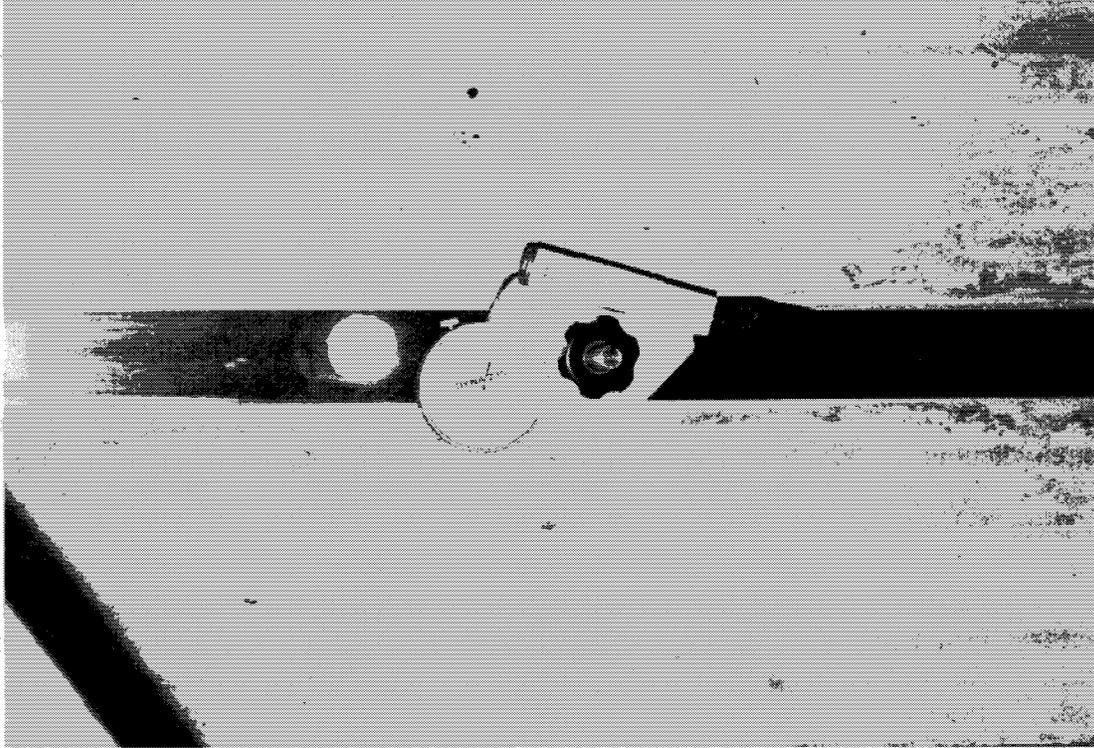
Tensile Bond Testing on Cored Carbon Laminates and Glued Steel Disks
